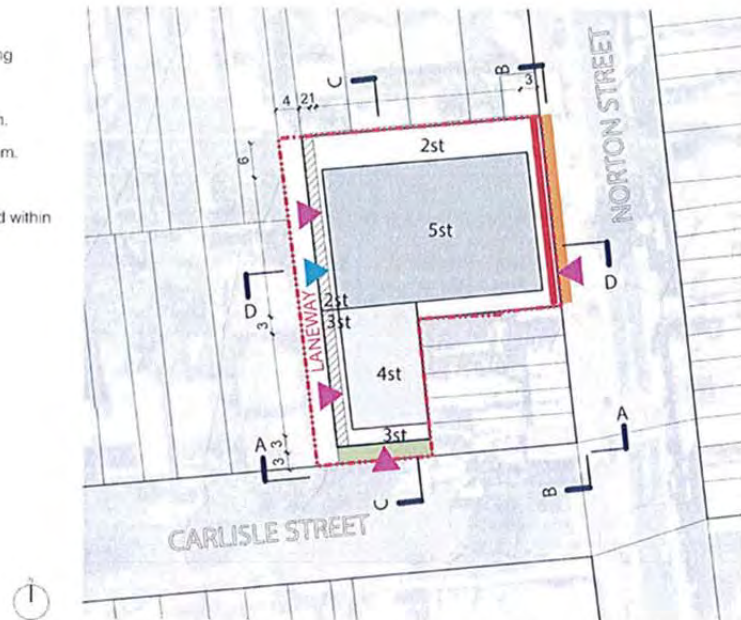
Norton Street and Carlisle Street - Building envelope plan
